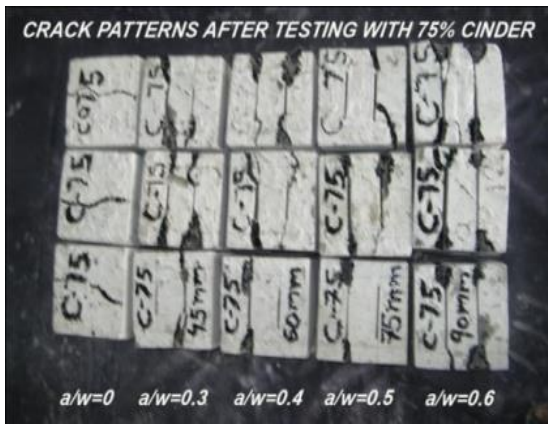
VIEW SHOWS THE CRACK PATTERNS AFTER TESTING OF C-75 SPECIMENS
